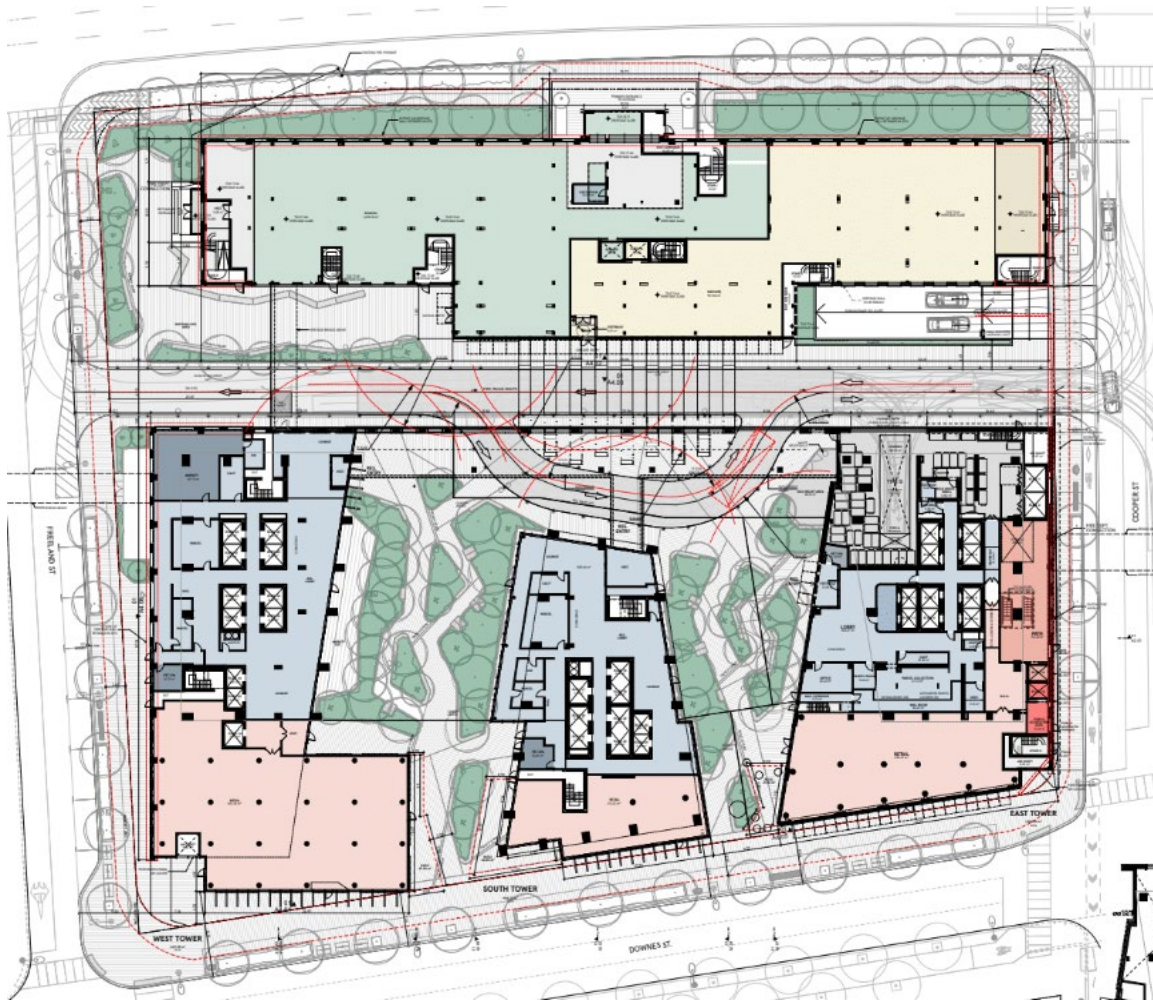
Ground floor/site plan for 55 Lake Shore Boulevard East included for illustration purposes (architectsAlliance, February 14, 2026).
